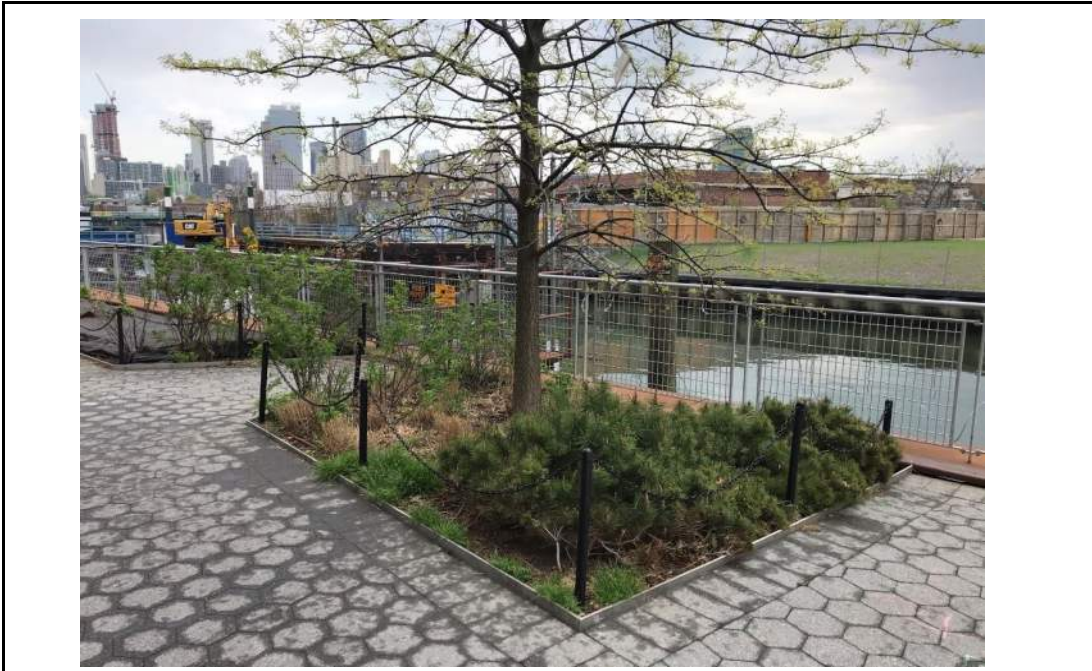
Landscaped esplanade area, facing east. 21 April 2021.
